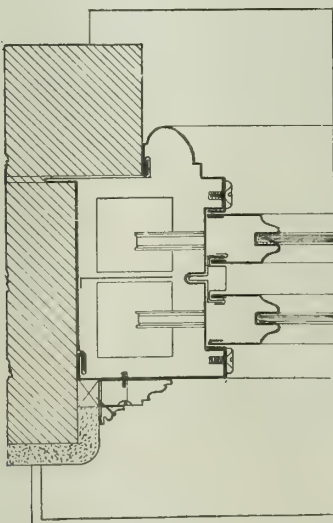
DETAIL OF POMEROY NO. 14 COUNTERBALANCED HEAVY PRESSED GALVANIZED STEEL WINDOW
